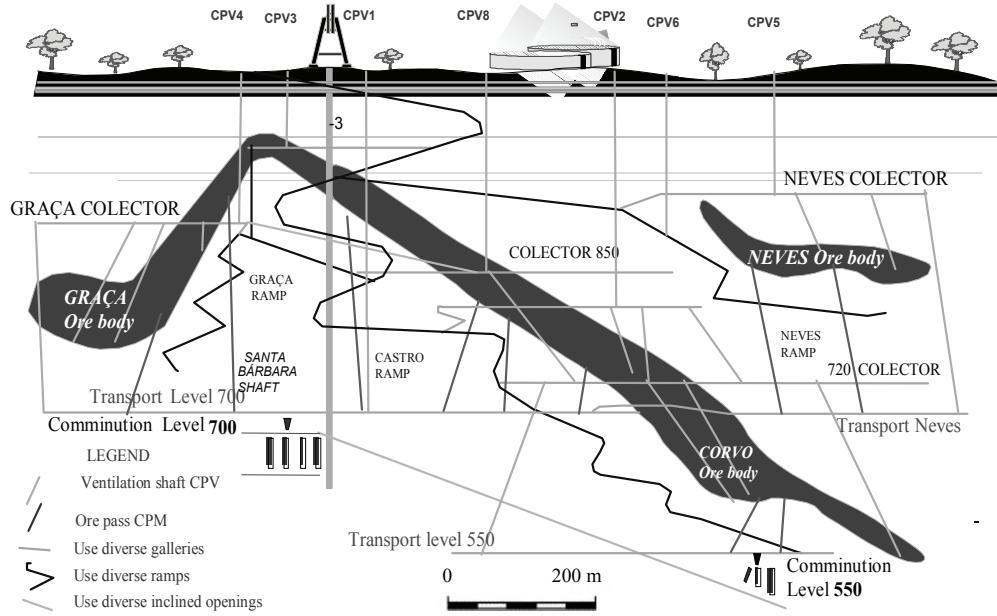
Neves Corvo underground principal openings, vertical section A-B 30° northeast (Navarro Torres et al., 2005).
